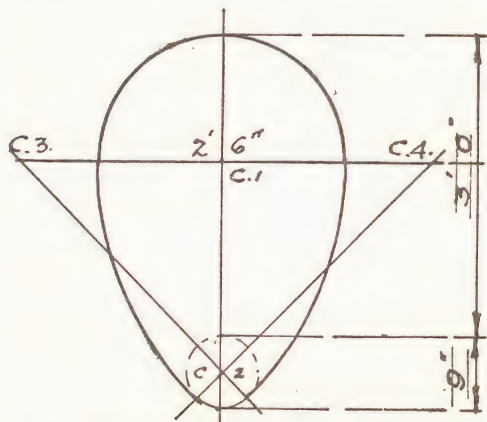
Method of drawing the section of egg-shaped sewer.
